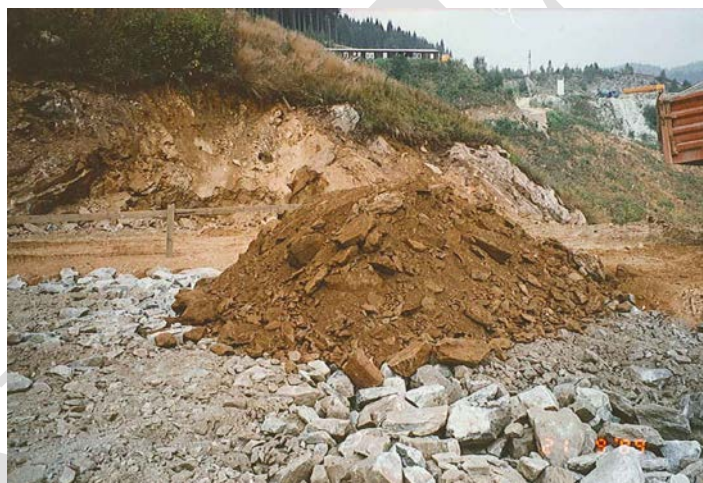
Rock material used for dam shoulders (grey solid rock – upstream dam shoulder, brown weathered rock – downstream dam shoulder)
